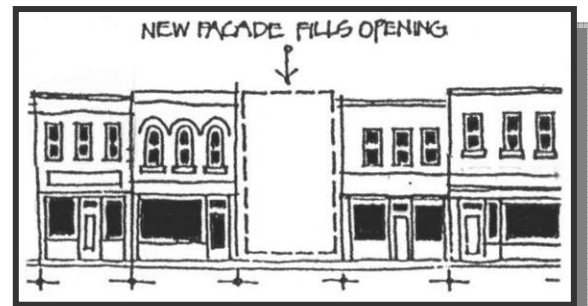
New structure to fill gap in existing street façade. Architecture to be compatible.
